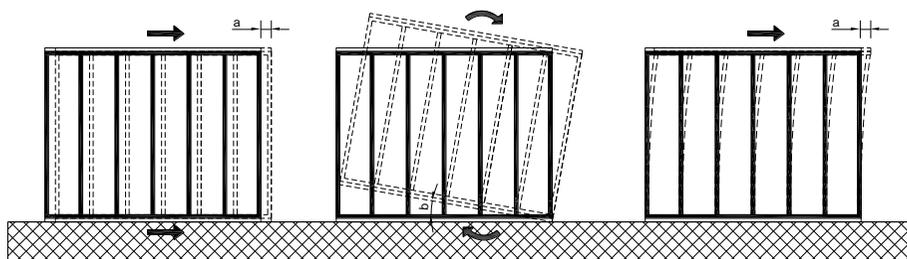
Sliding, overturning (tilting), and racking of timber shear-walls
